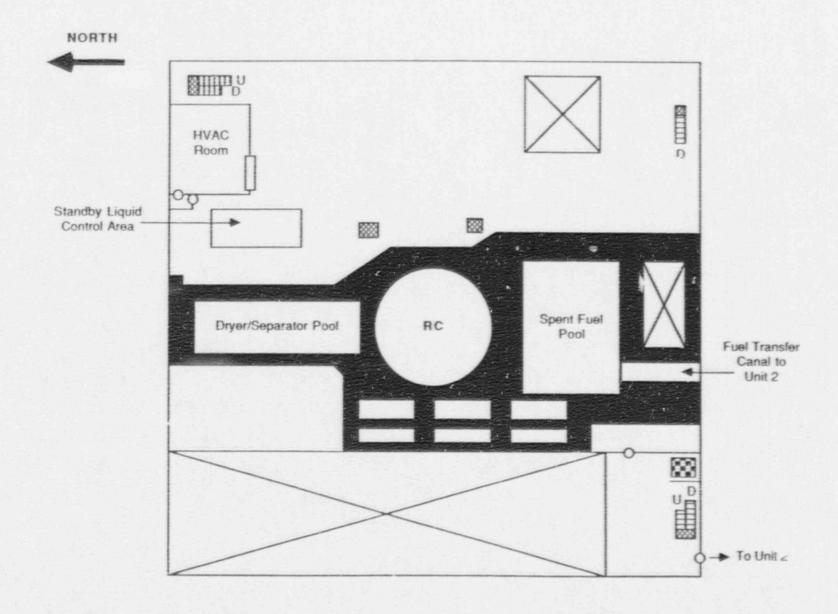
Hatch Unit 1 Reactor Building Arrangement - Elevation 203 ft.
